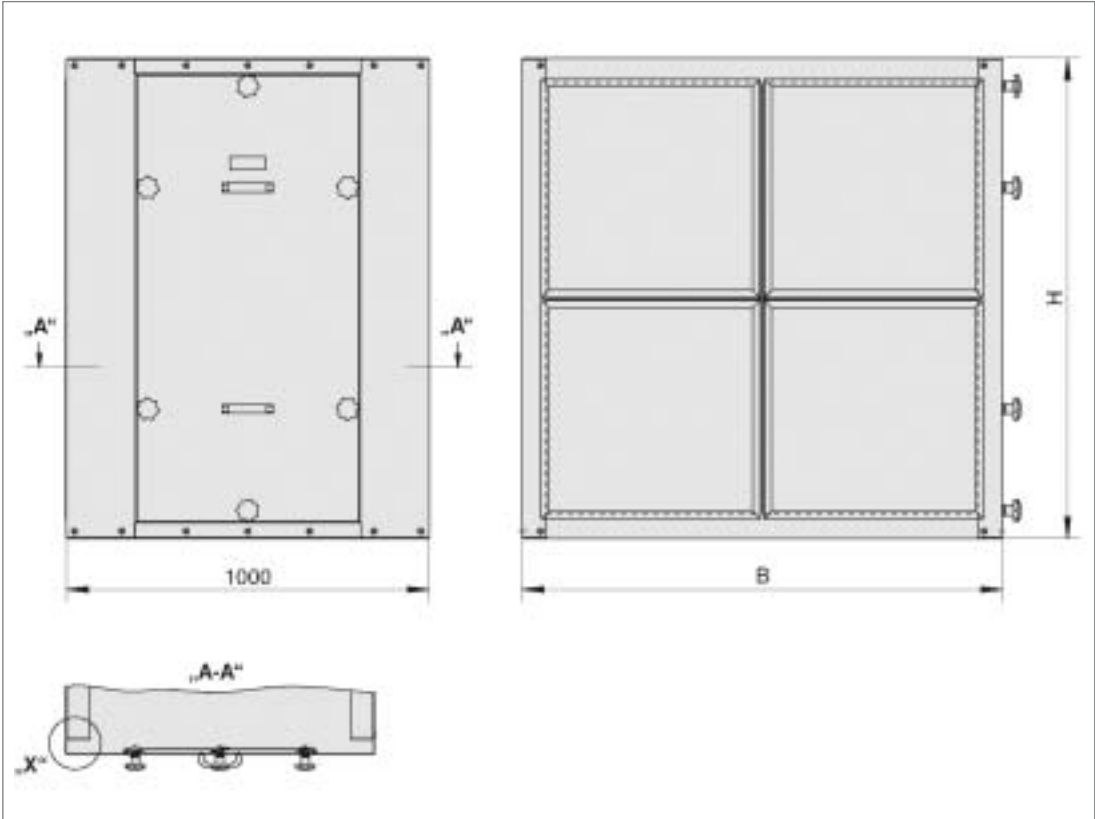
Universal casing for duct installation F340 (shown: service door on right)
